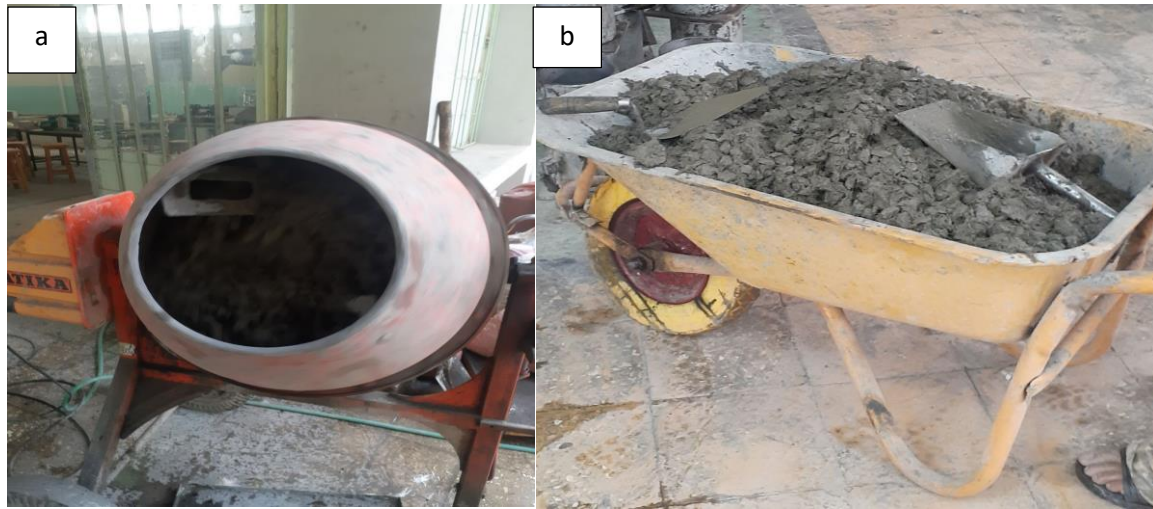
7: Concrete Mixing: Mixer (a), Fresh mixed concrete (b)
